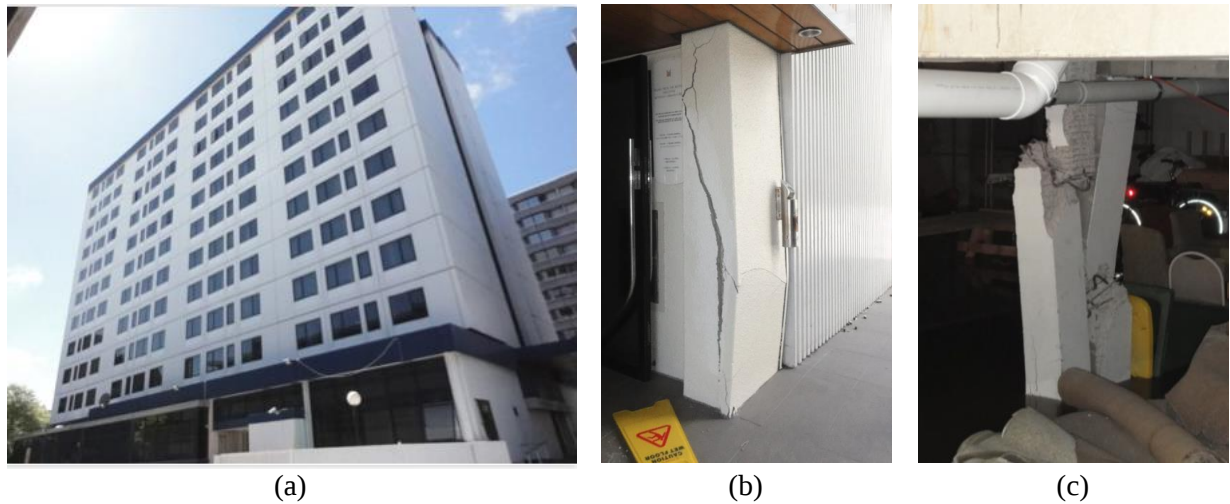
11-storey RC frame with shear walls building in Central Business District of Christchurch (EERI, n.d.): (a) building prior to 2010-2011 earthquake series, (b) damage to column in the first floor and (c) shear and axial failure of column in the basement
